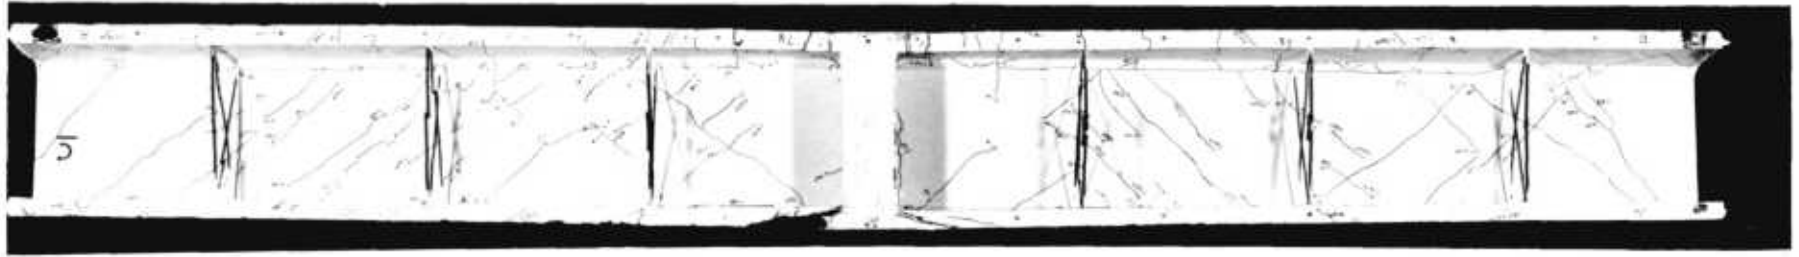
Crack Development on Channel Section with Single Stirrup Reinforcement
